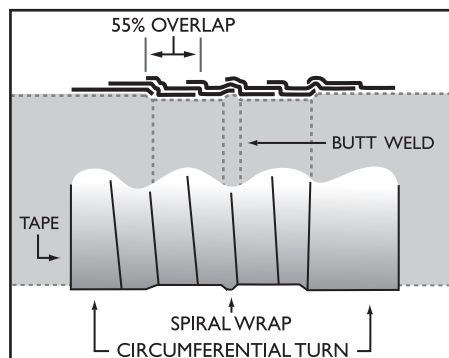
Butt weld and existing coating ready for overwrapping with tape. Note cutback of coating can be 75mm -150mm either side of the weld except on FBE coated pipe.
